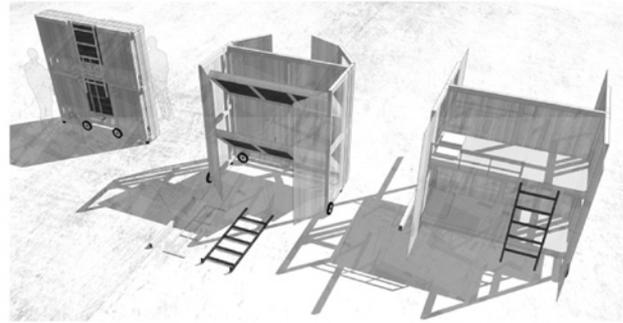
Foldable Sleeping Module (single unit) which can be wheeled into place, unfolded and setup in minutes.
